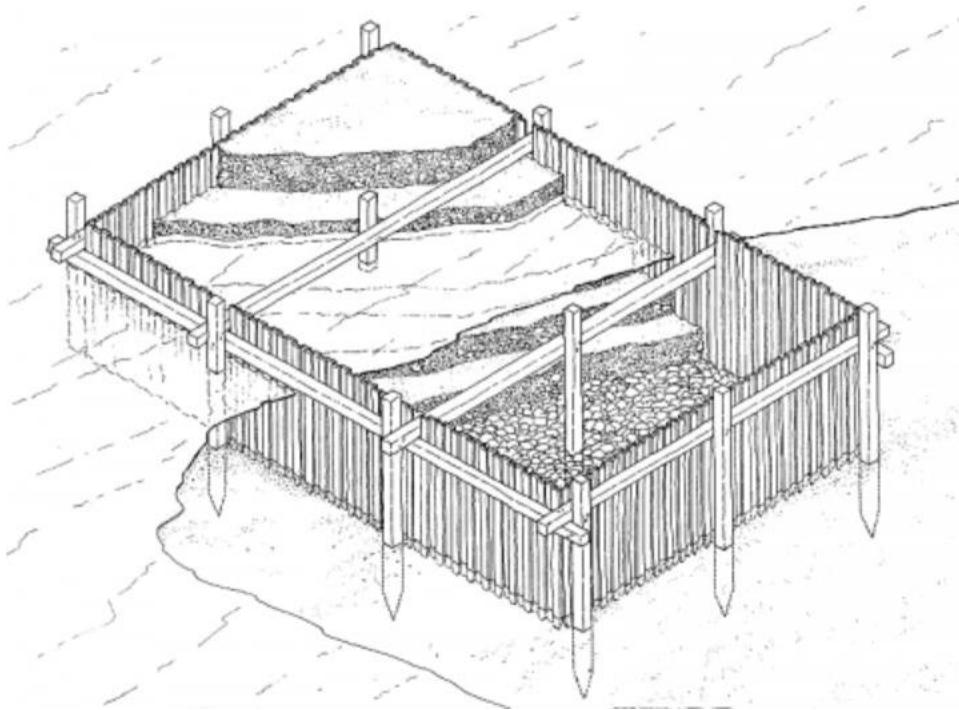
Timber Caisson (https://www.researchgate.net/figure/Timber-caisson-acc-to-Brandon_fig15_339697699)
